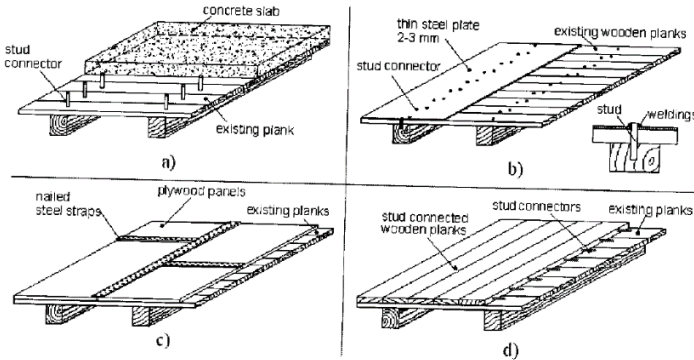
Schematic illustration of wooden floor in-plane shear reinforcement via overlaying a) ordinary thin RC slab; b) thin steel plate; c) nailed plywood panels; and d) stud-connected wooden planks. From [25].
